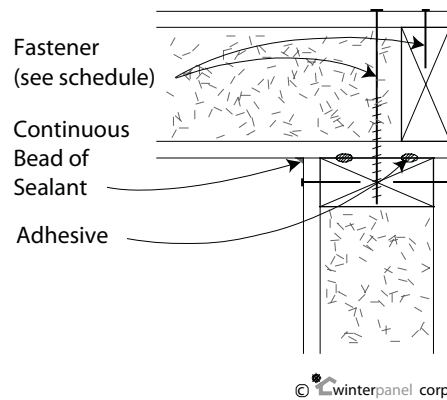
Panel Corner Joints. Note the beads of adhesive connecting these two panels.
